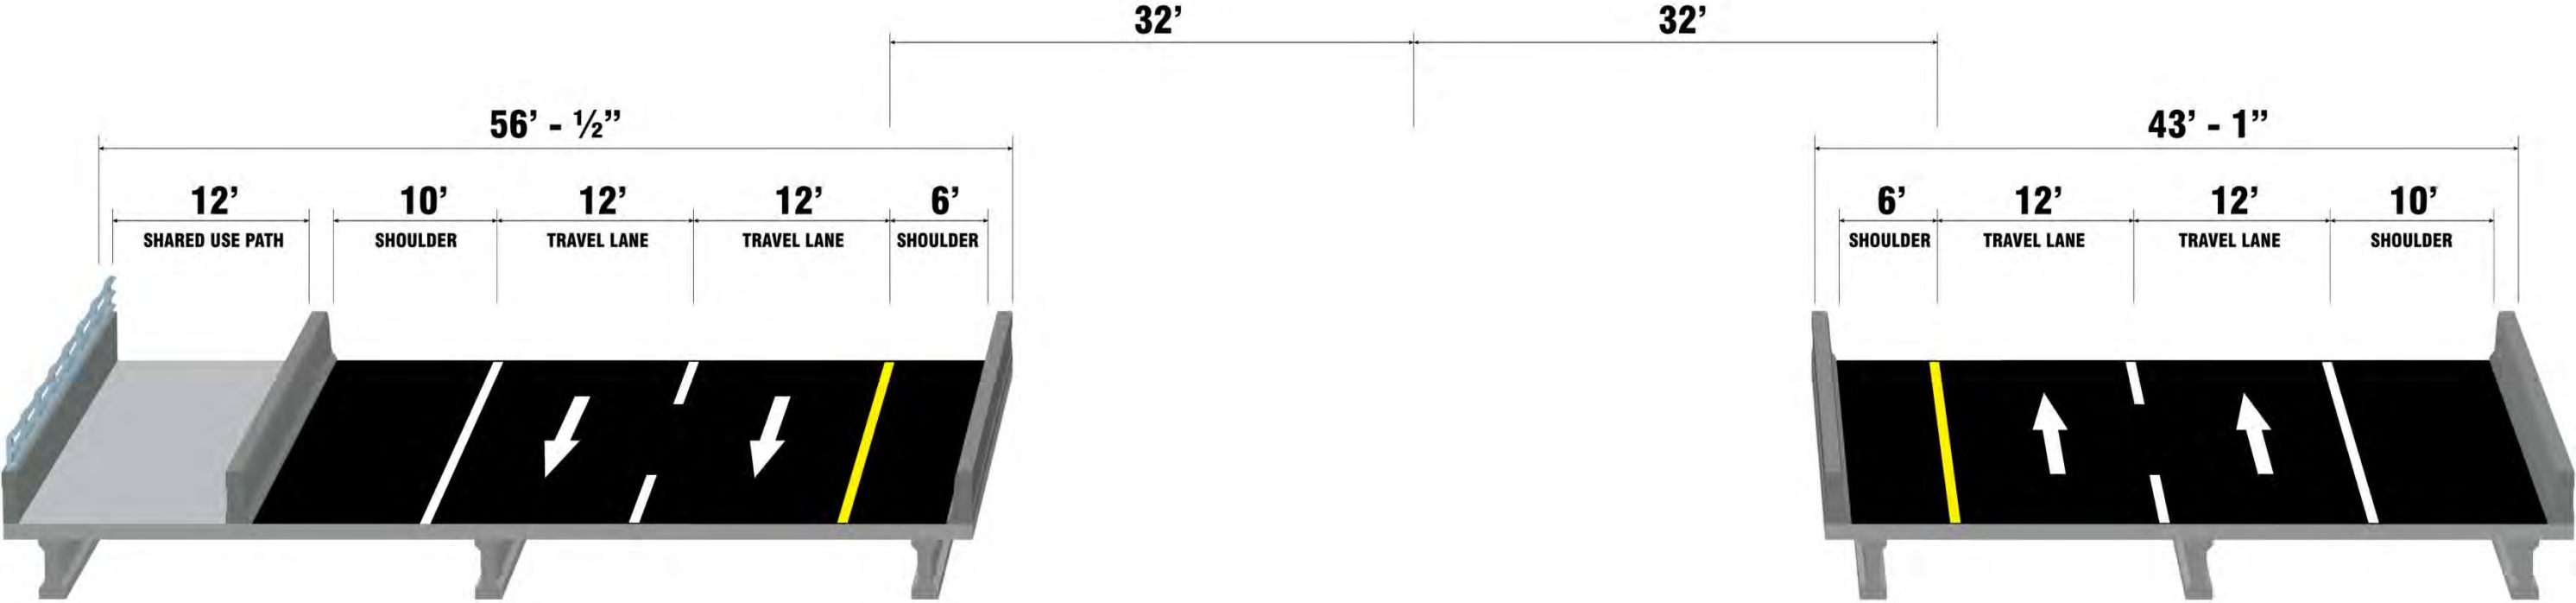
Proposed Ultimate Bridge Typical Sections
